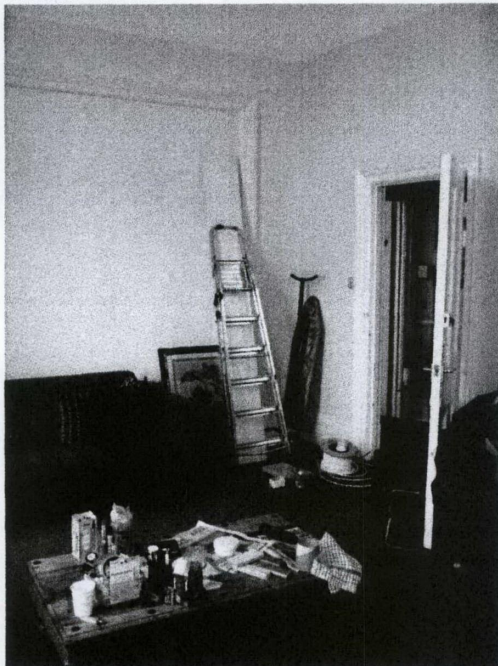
showing the location of the proposed acoustic stud wall. The existing blocked-up opening can be seen in the background with the ladder leaning against it.
